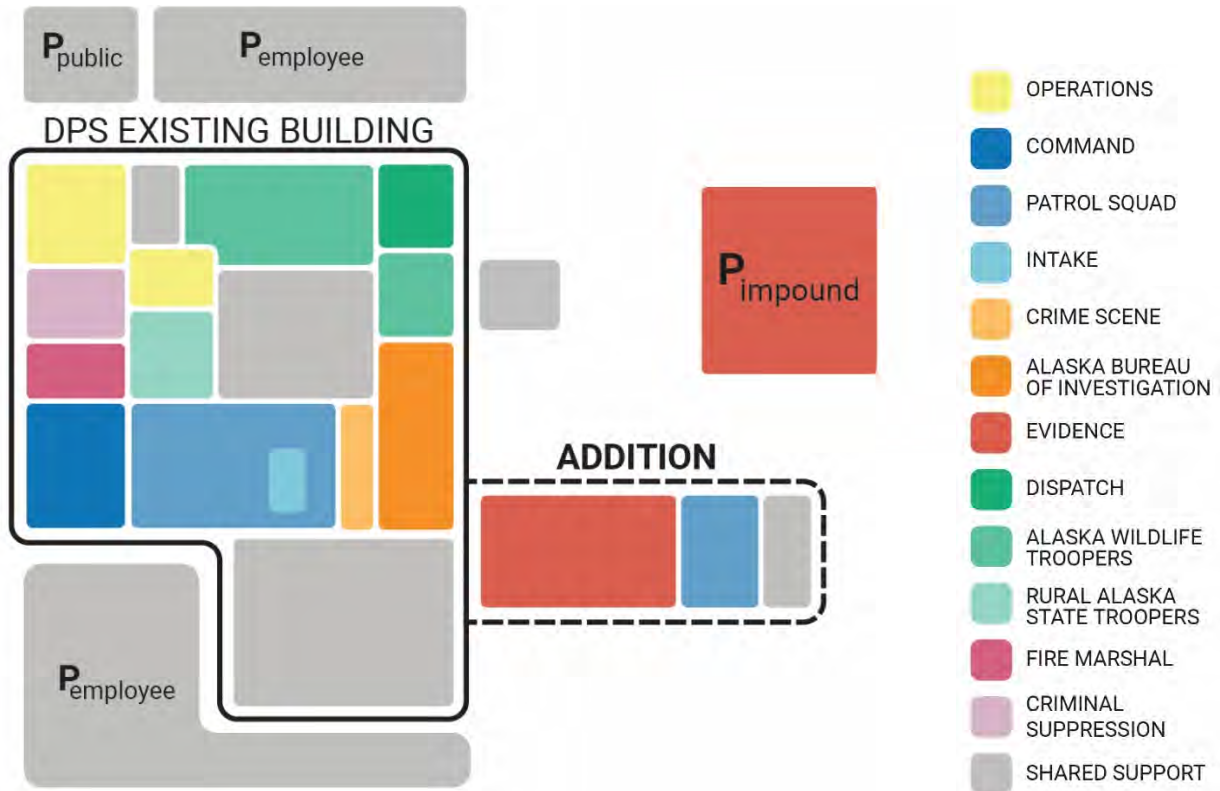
Renovated building layout diagram, see page 26 for additional information.
